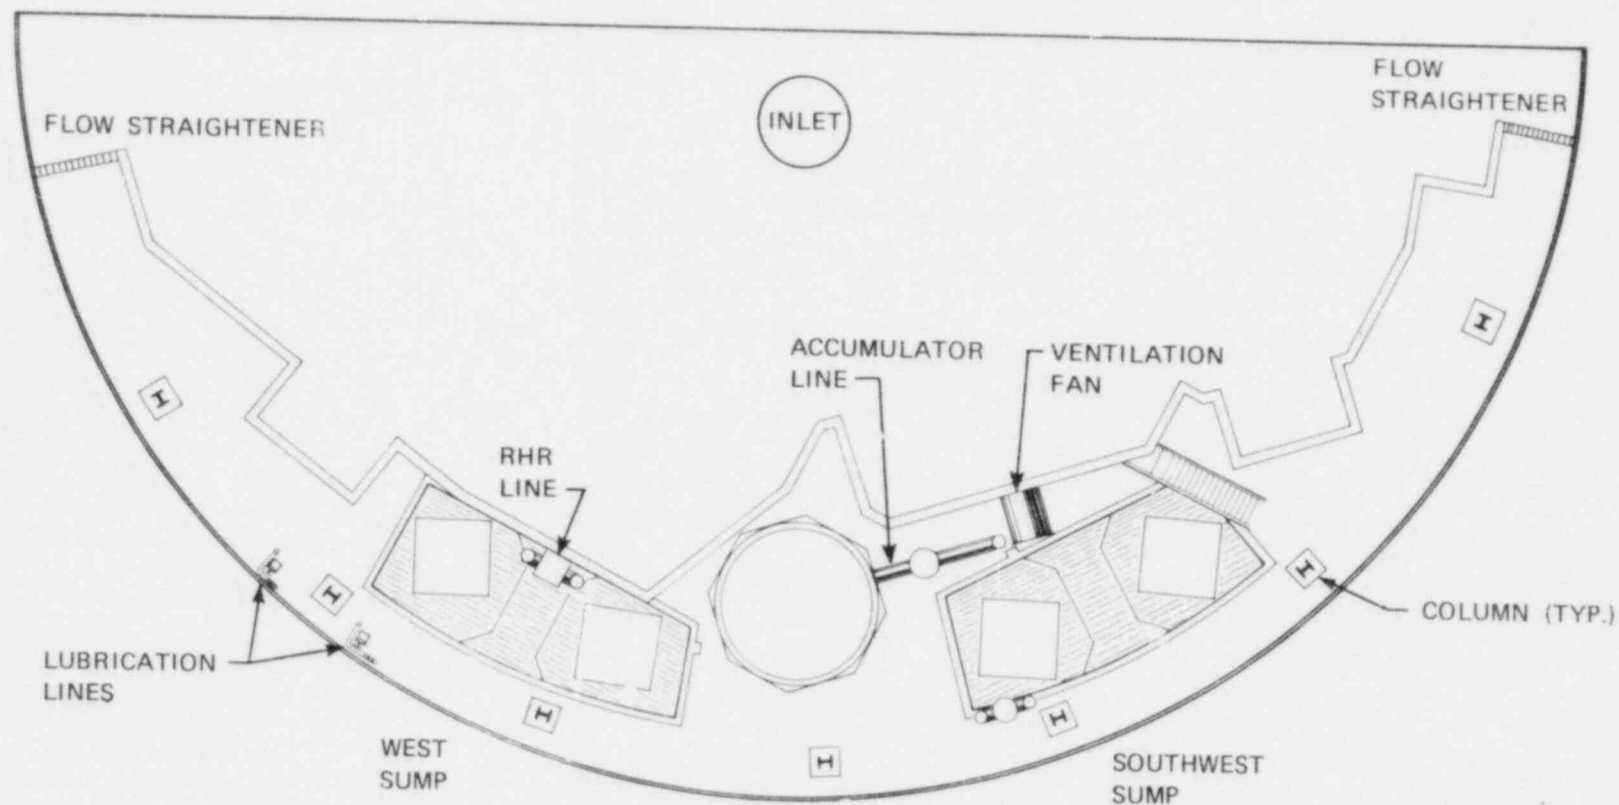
PLAN VIEW MODEL WITH DETAILS
